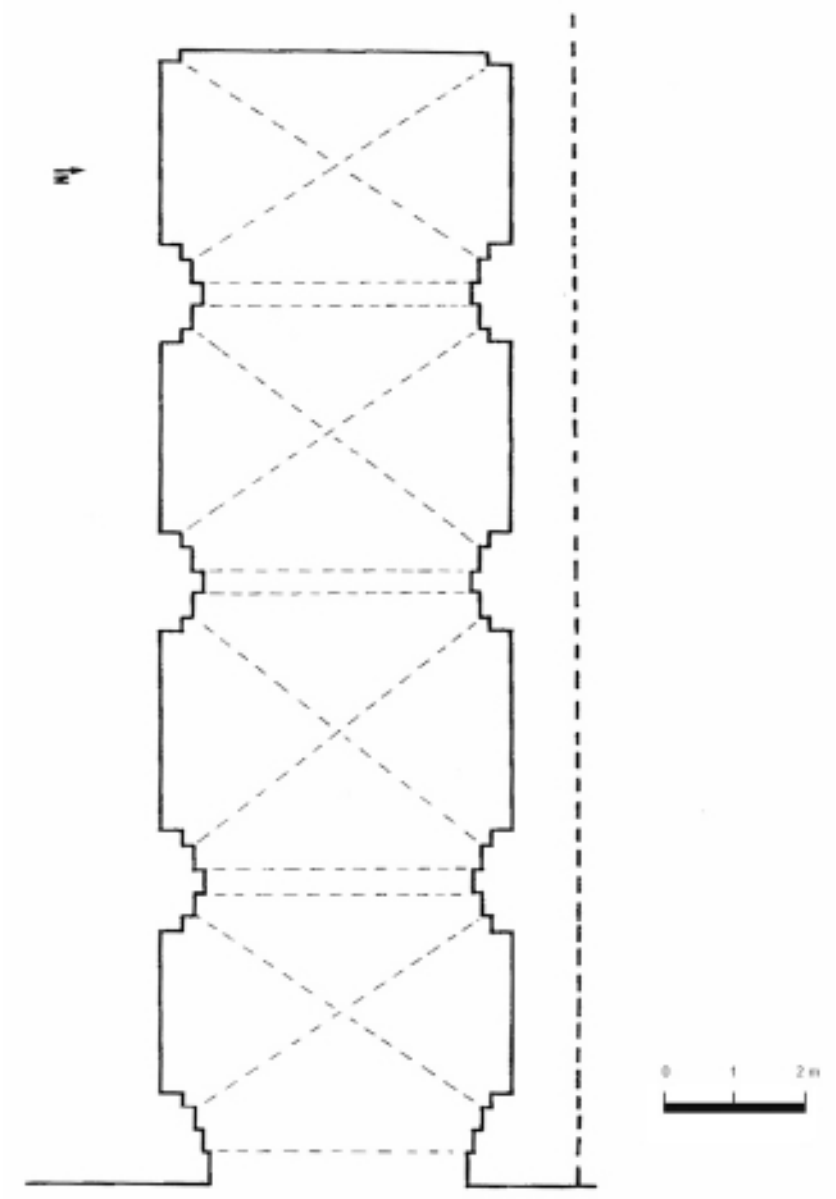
Plan of house in Habad Street, Jerusalem (House 8:5) (drawing by author).
